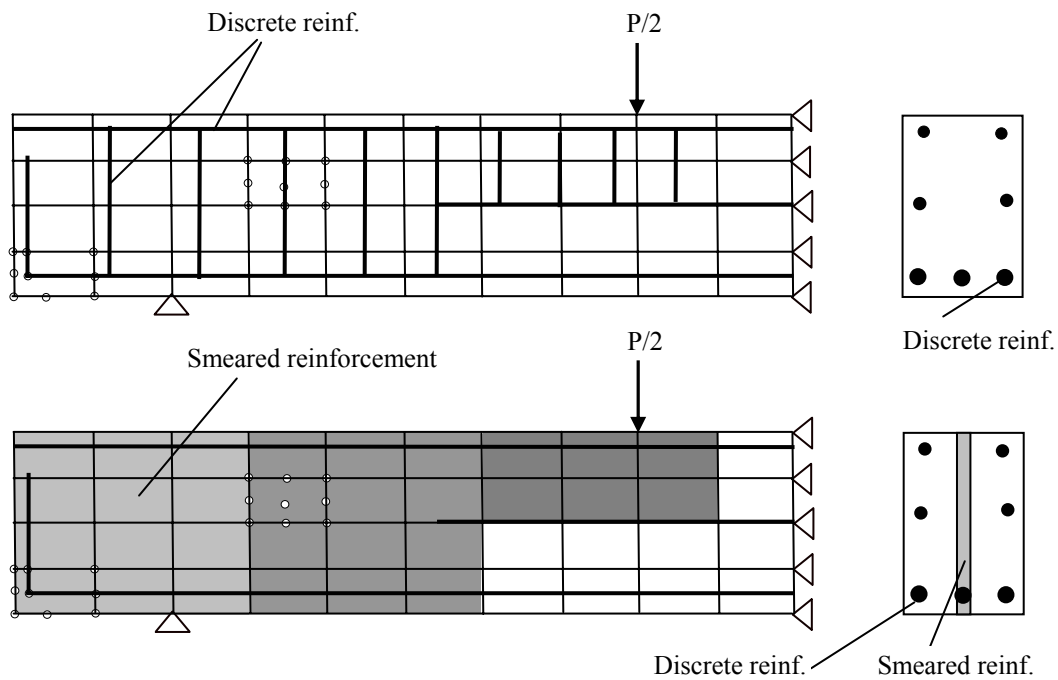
F.E. Modelling of Beam C1.8: (a) Discrete and (b) Mixed reinforcement Models.
